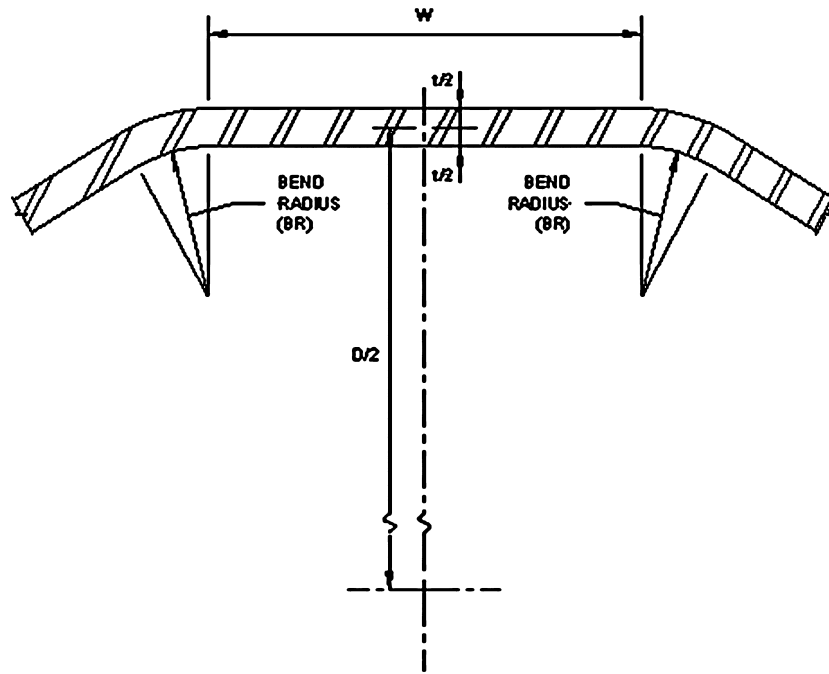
TYPICAL DIMENSIONS OF POLYGON SECTIONS.
